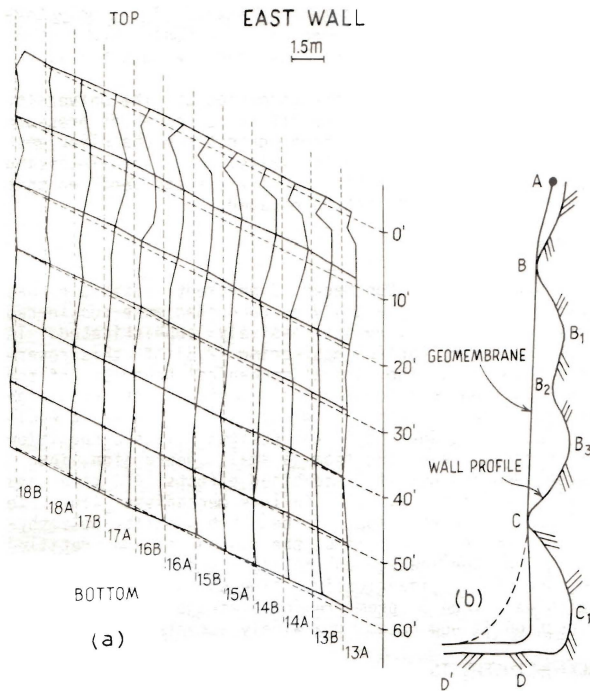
(a) Surveyed shape of the East wall of the cavity after excavation. (b) Assumed shape of the geomembrane after installation.
